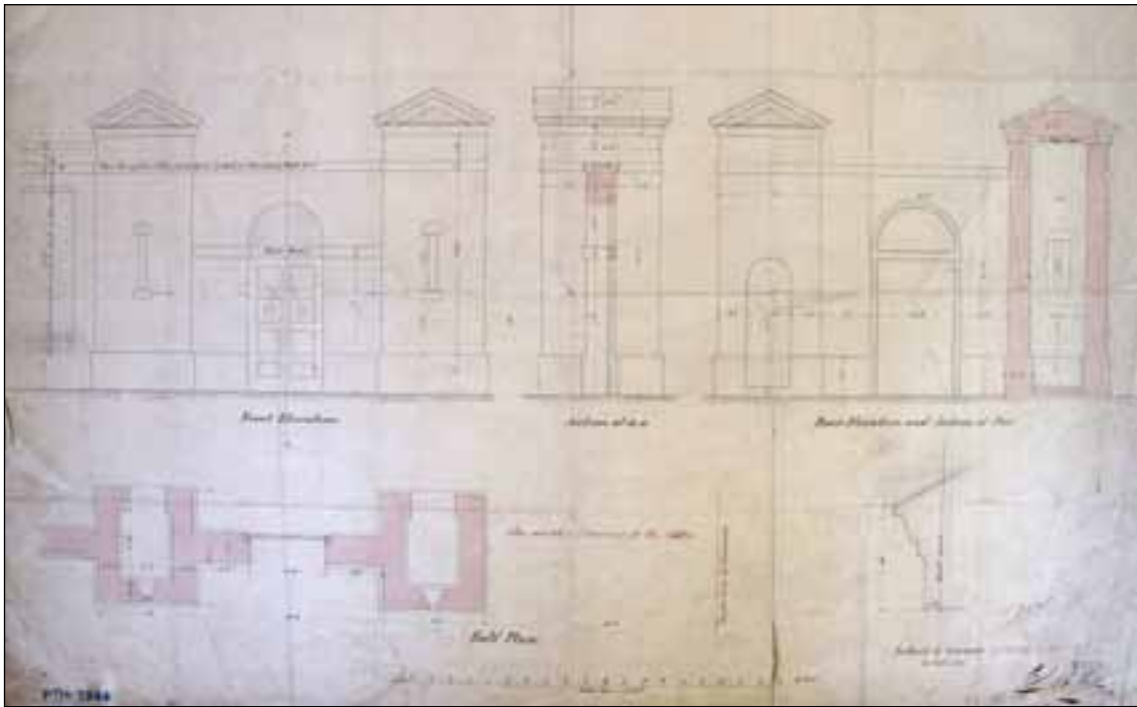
Plan and section of entrance gateway (EHA MD 95/6512)
